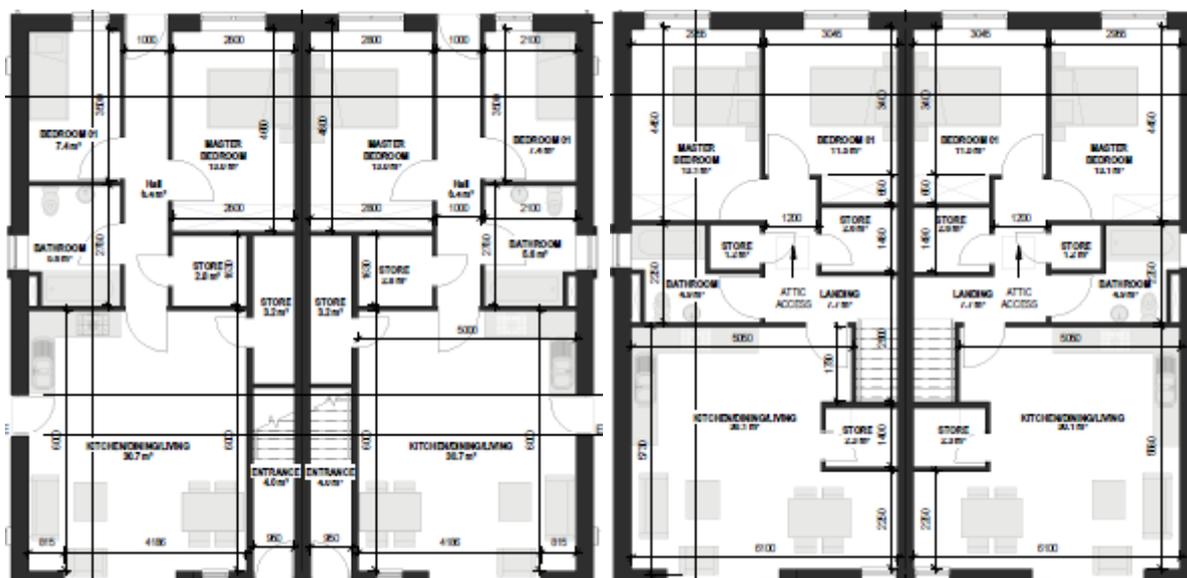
Ground floor level (left) and first floor level (right) of Maisonette buildings accommodating Maisonette Types 7.1-7.4.
